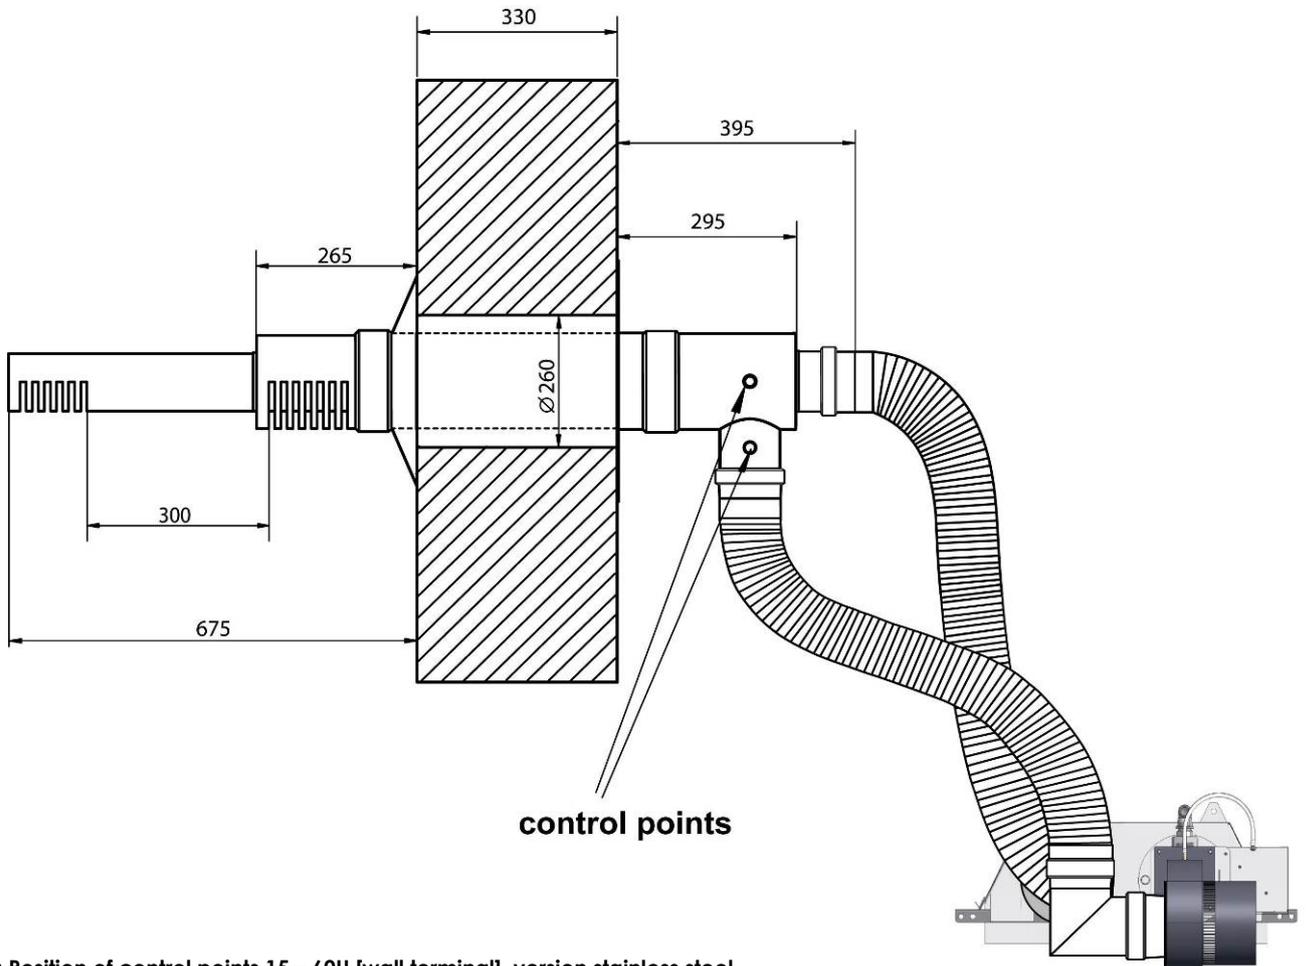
Position of control points 15 – 60U [wall terminal], version stainless steel
